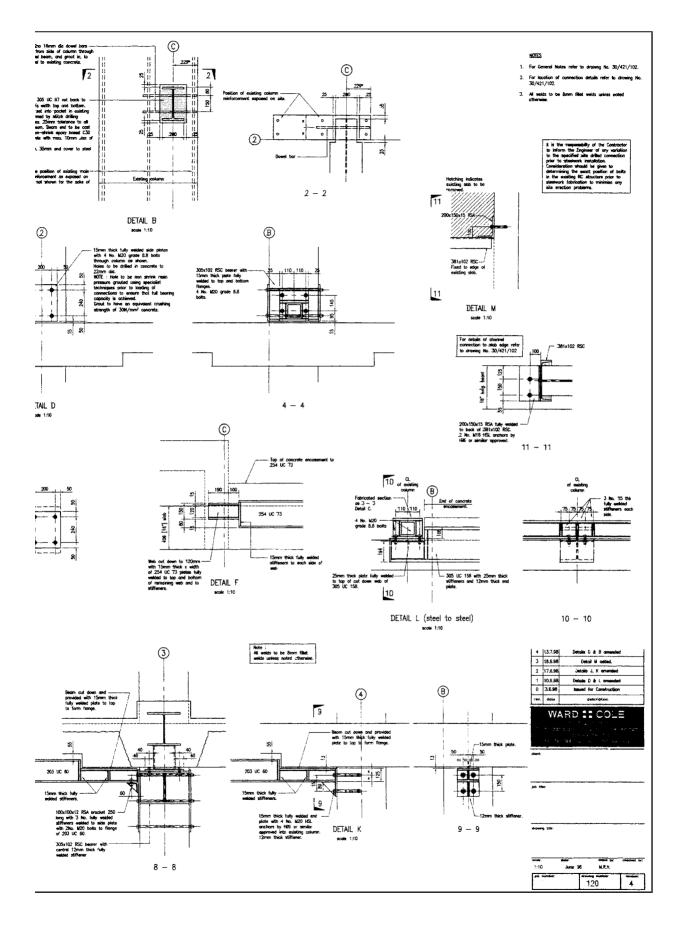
Typical fastenings details—construction drawing 1
